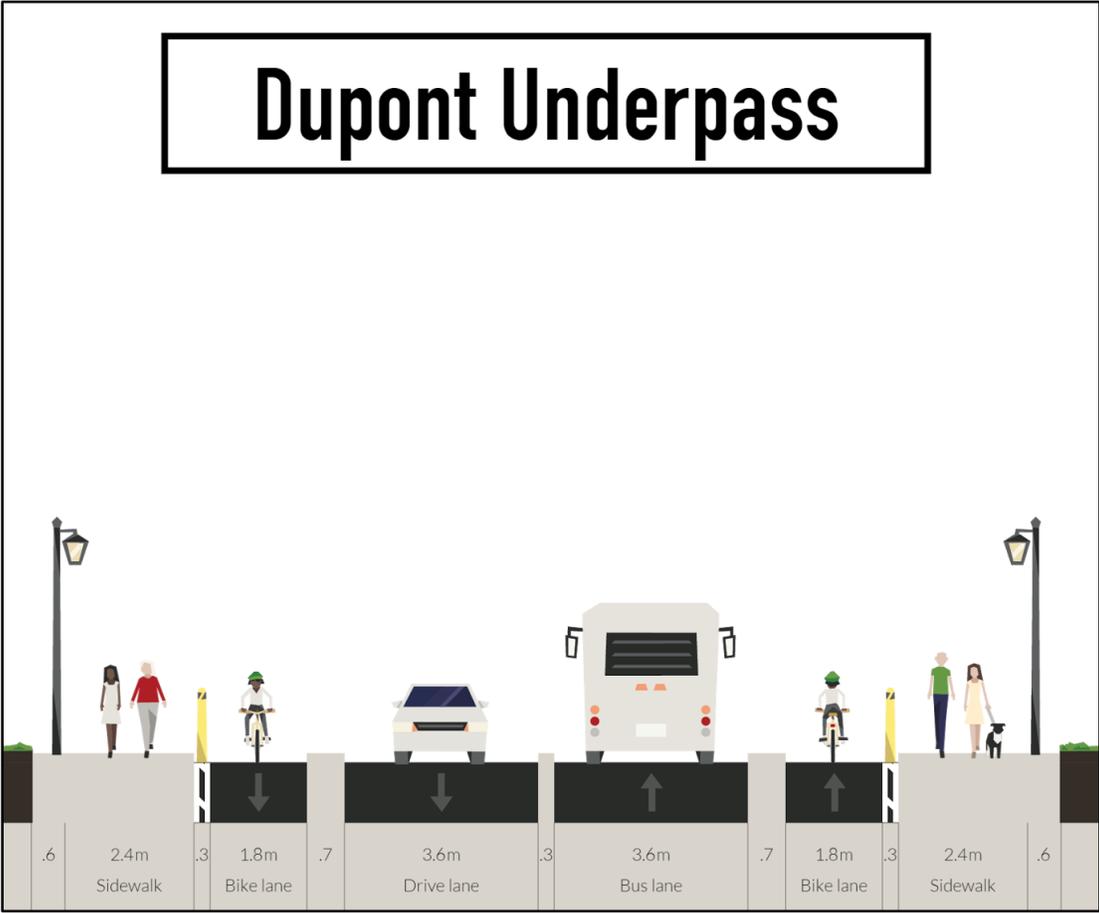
Cross-section of the proposed Dupont Underpass (Figure 4(6)).
